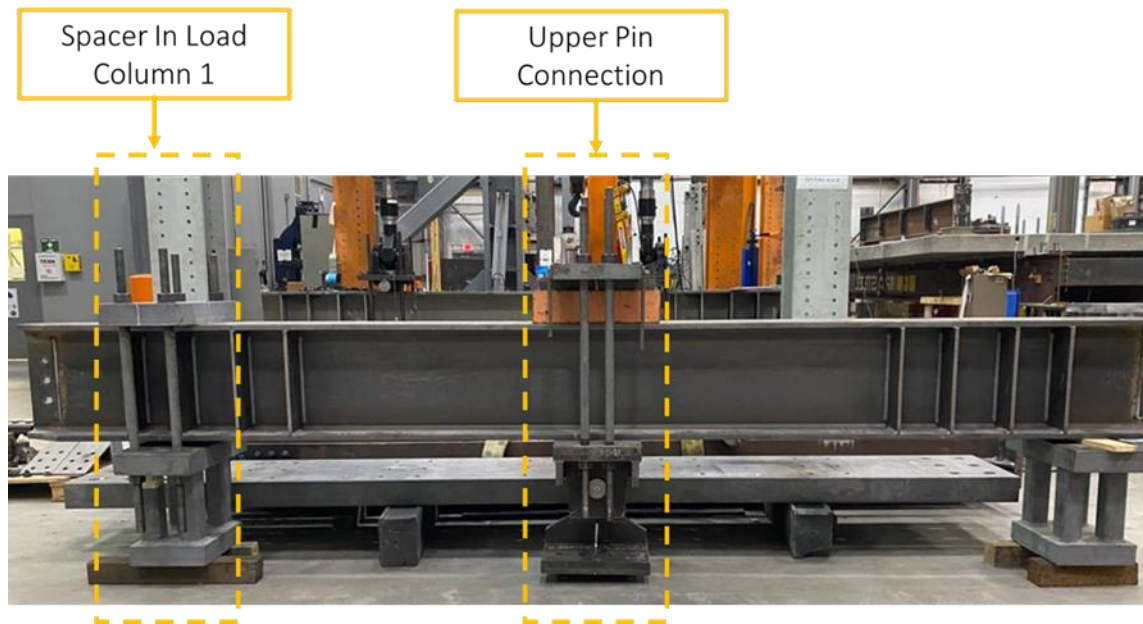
Loading Beam (W16×89) with upper pin connection and the spacer.
